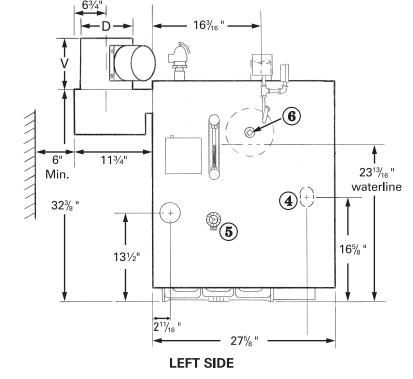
Dimensional drawing – ALL DIMENSIONS IN INCHES
